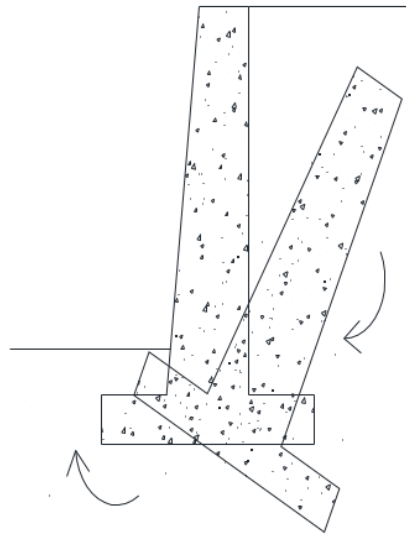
Failure of retaining wall by bearing capacity
